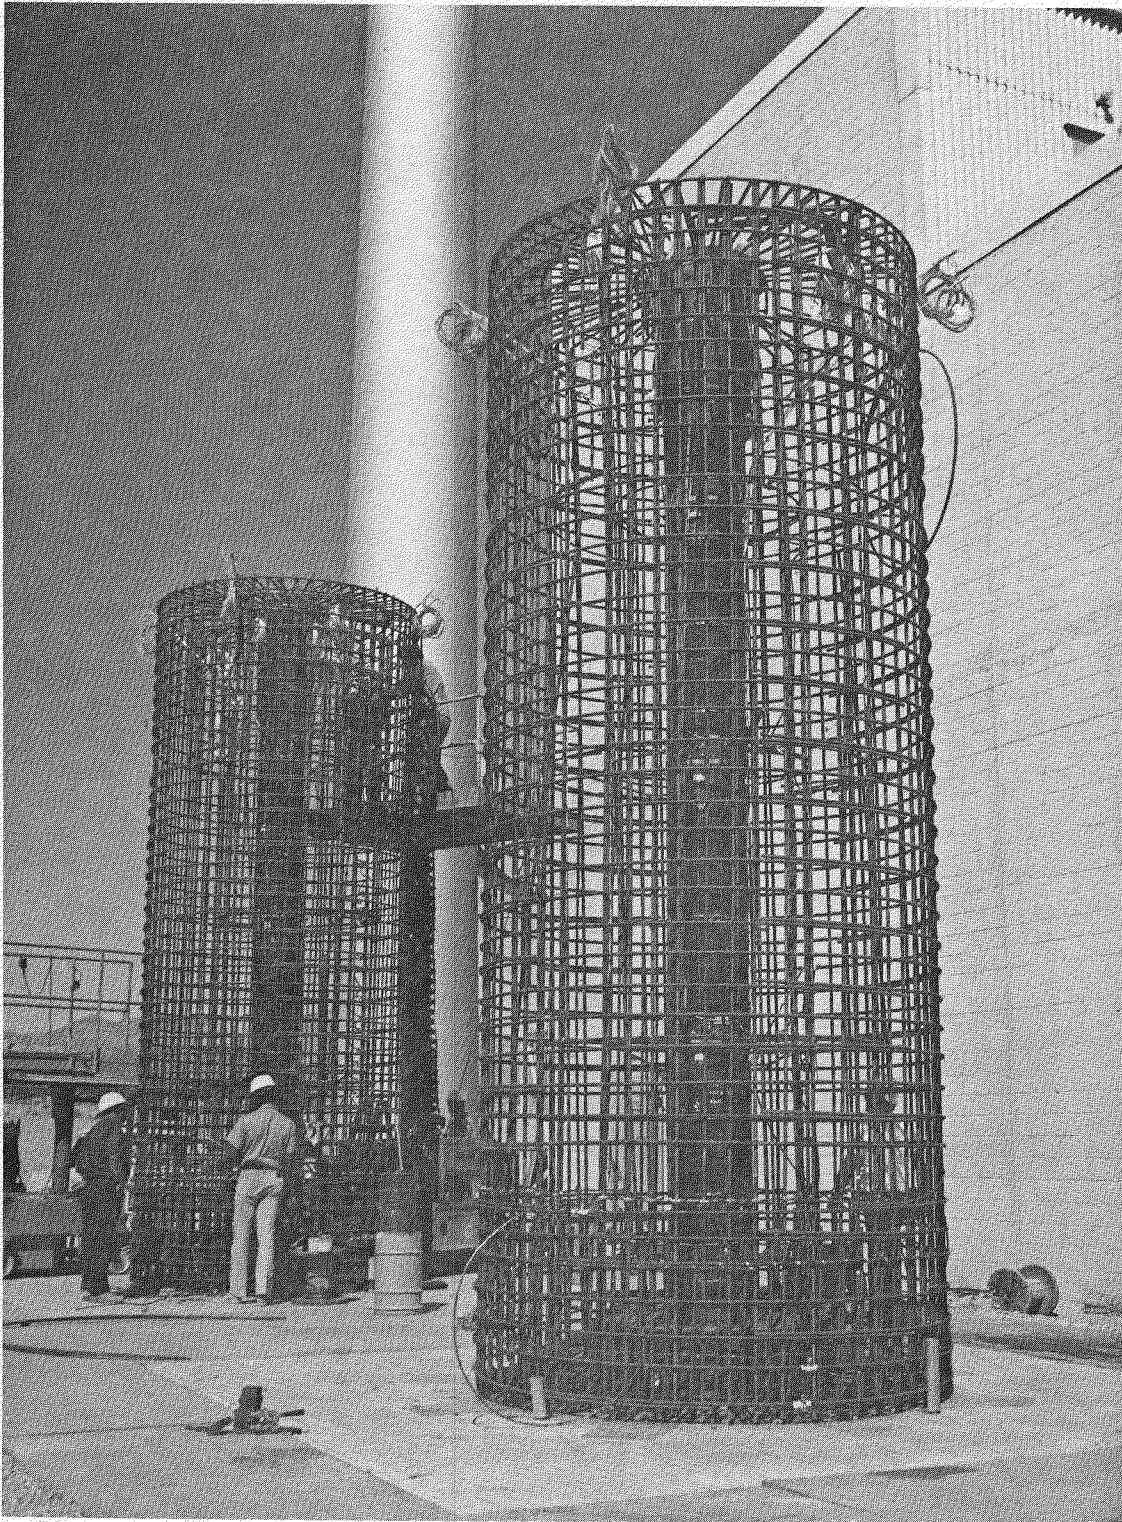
Sealed Storage Cask Rebar Installation Completed Prior to Concrete Pouring
